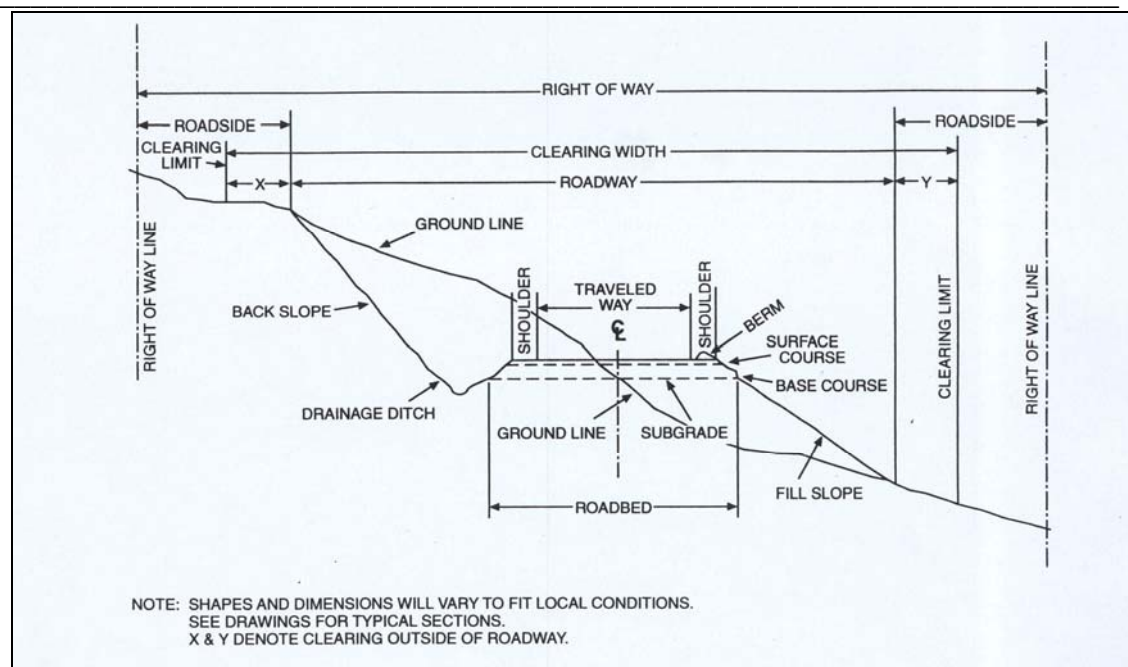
Design Components of “Cut and Fill” Road Construction
